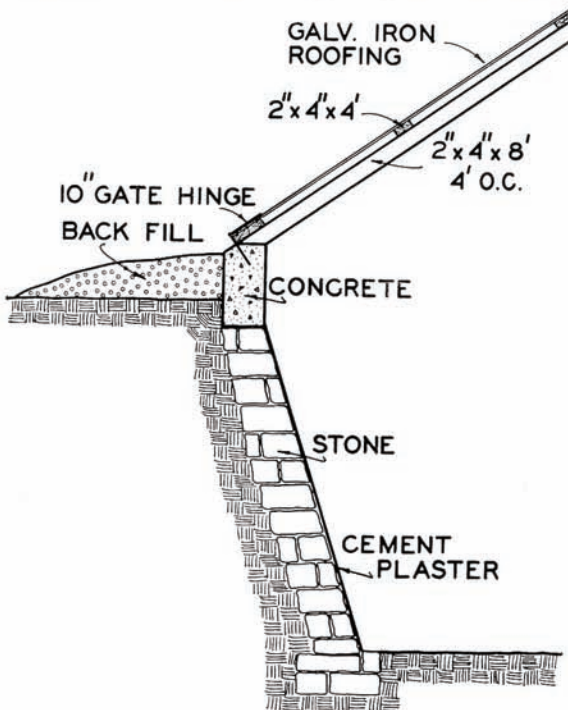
If stone walls are used the thickness should be about 12 inches.. Two or more coats of cement plaster will give the walls a smoother finish.
